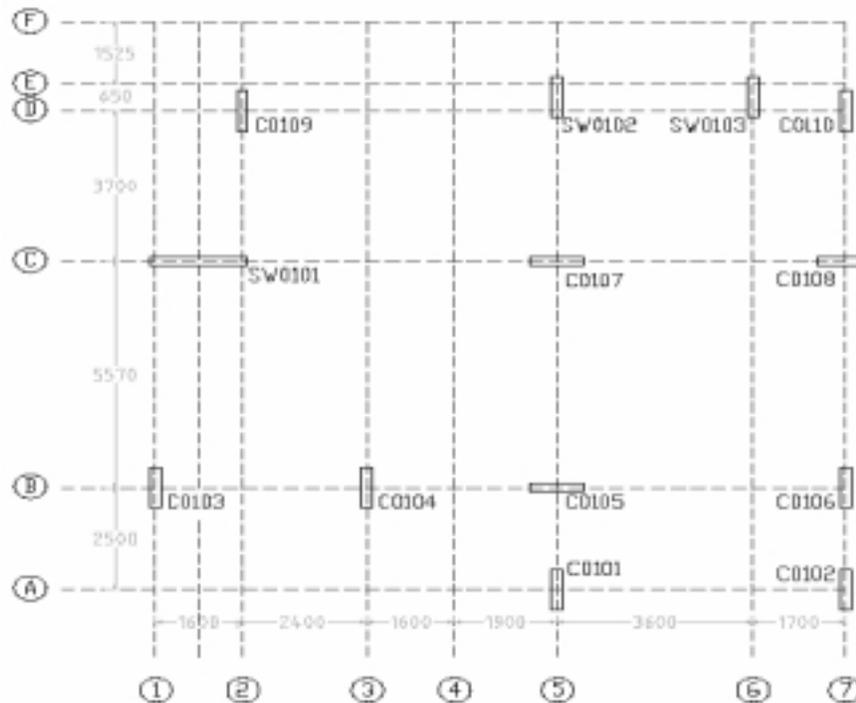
Base Floor Column & Shear Wall Layout of Building
